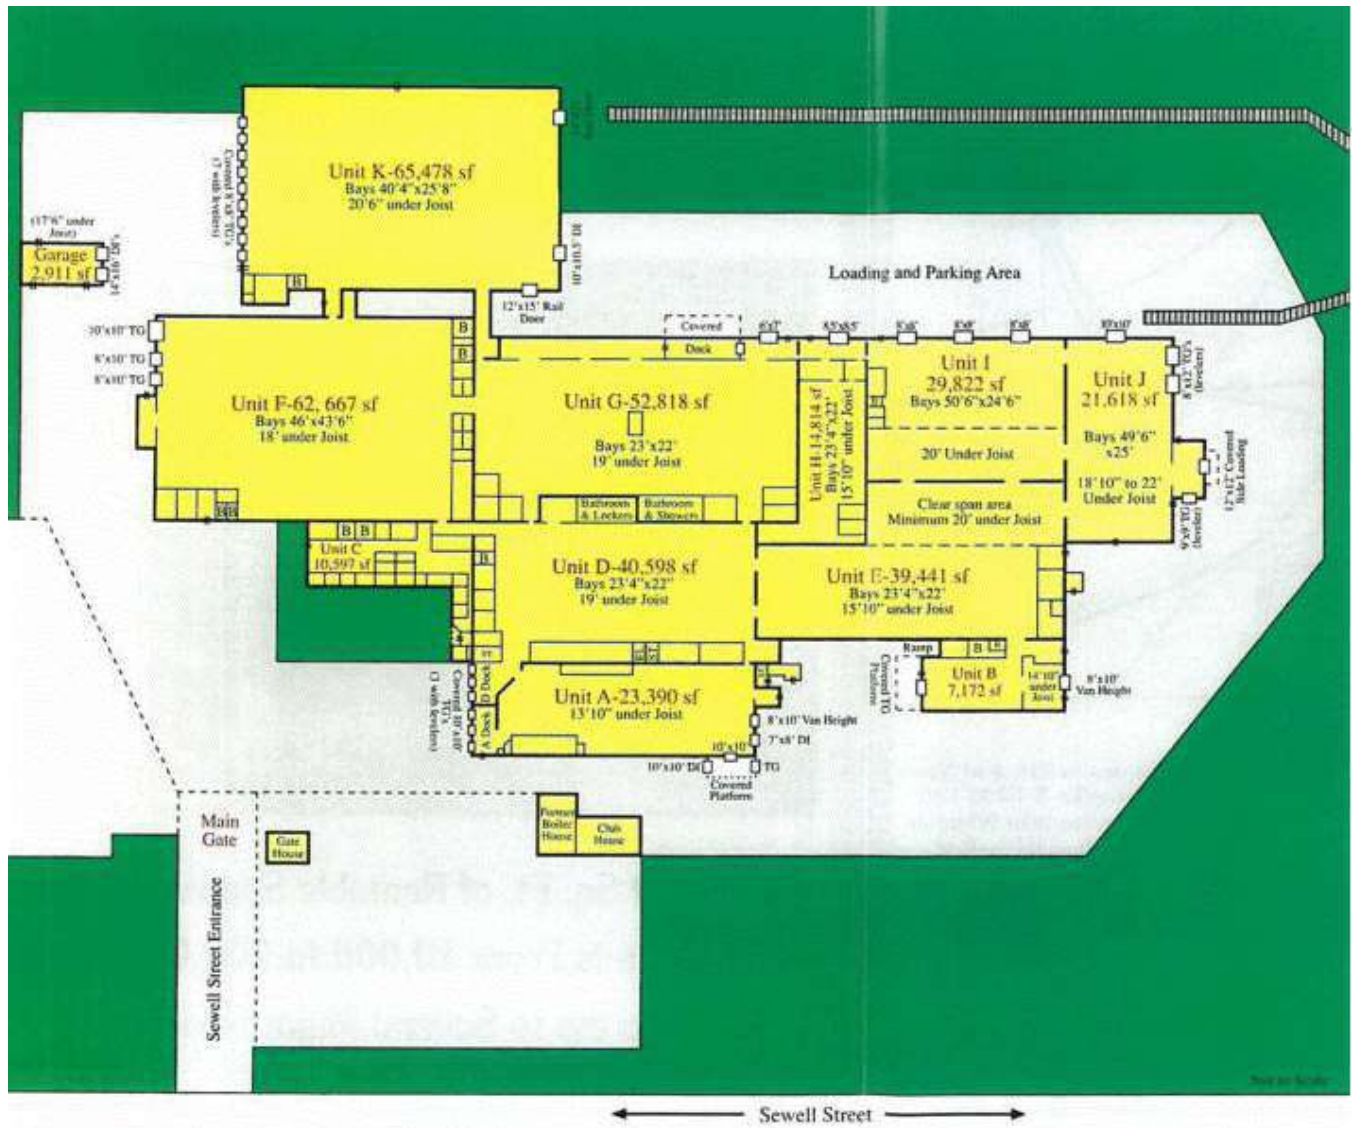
Recent floor plan of the Route 55 Industrial Center, showing the current layout of units within the former plant. The garage (top left) remains extant, but the gate house, former boiler house, and club house shown at the bottom of this image are no longer present. The extant railroad siding is shown at top right. The extant fire pump house, water tank, and utility meter building are not shown. Note this plan is oriented with Sewell Street at the bottom (Source: Industrial Investments, Inc. website, accessed May 27, 2014).
